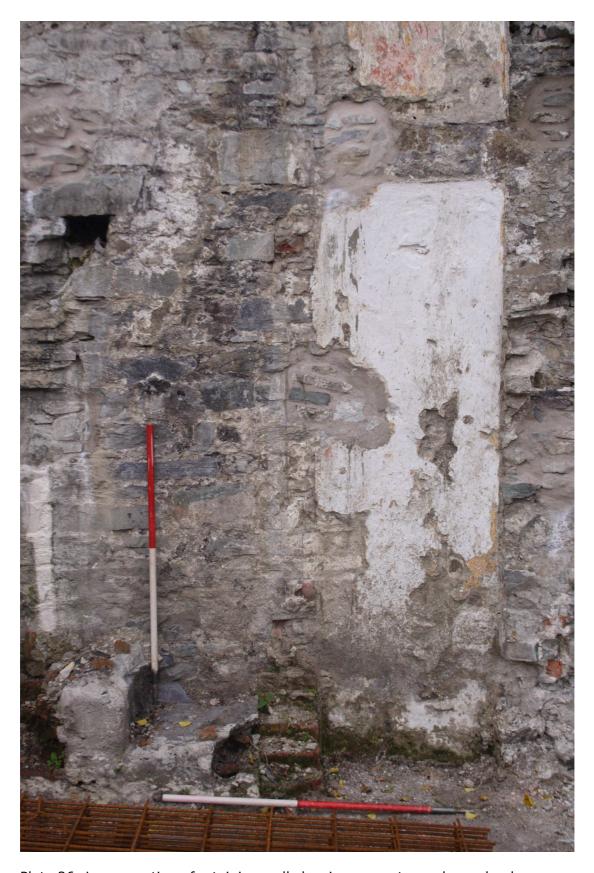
Lower section of retaining wall showing concrete render and unknown feature relating to cottage. Damaged put log in upper left hand edge of image, shot 8.
